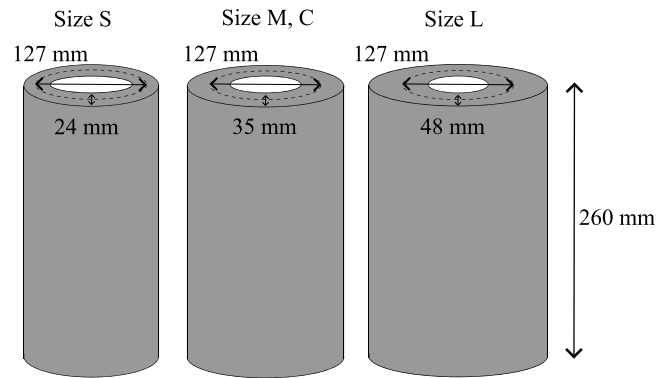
Dimensions of the printed specimens for compressive strength measurements.
